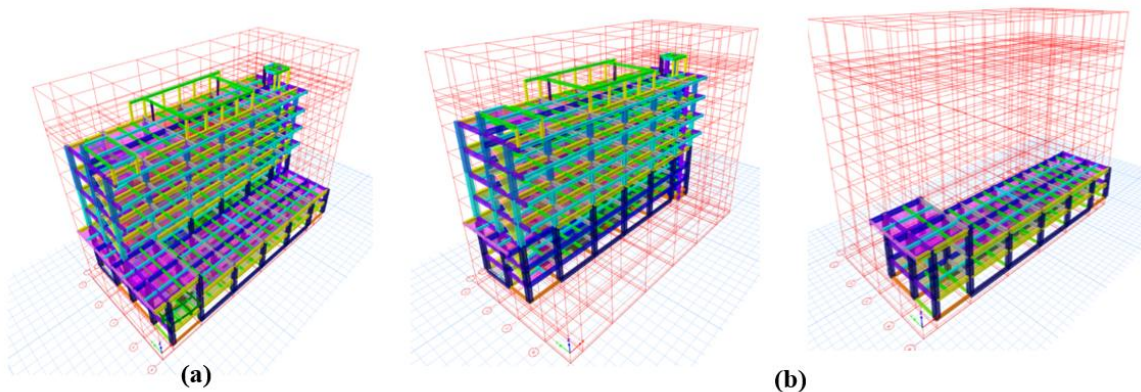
Structural Models Used in the Analysis: (A) Existing Building Without Expansion Joints, (B) Proposed Building Configuration with Expansion Joints.
